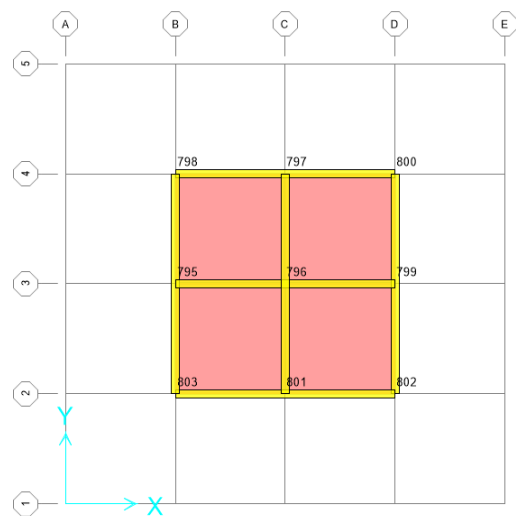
Plan view of G+20 Perimeter shear wall model at setback
